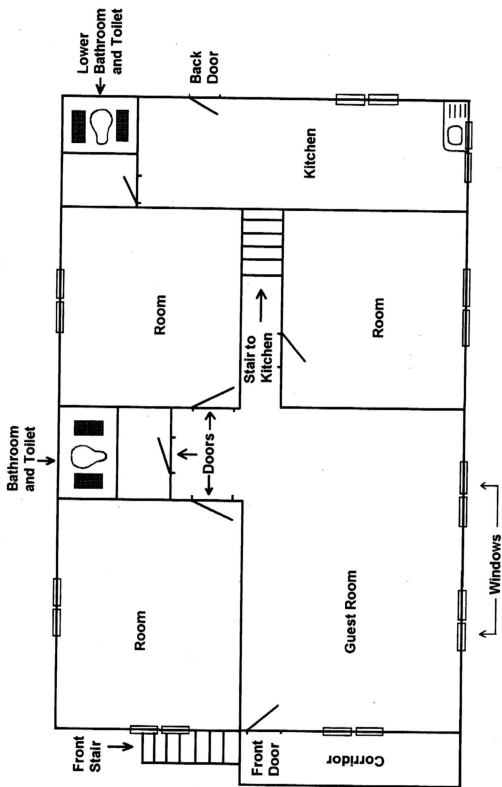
Floor plan of a house in the Tampasak resettlement area
